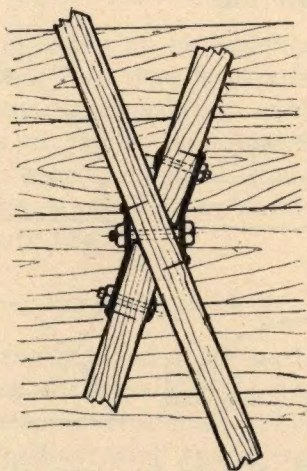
Special joint method of bolting lamellas for larger spans or heavier loadings.
